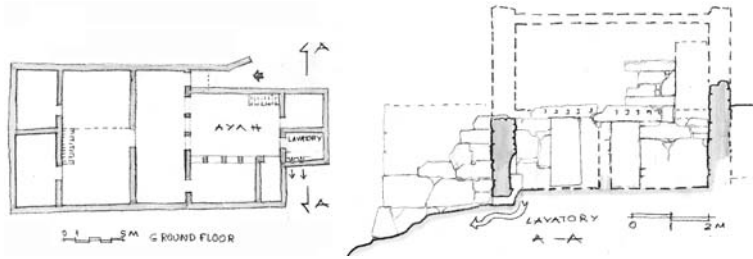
Plan of a typical house in Dystos and the section of the ruined house (copyright permission with G. Antoniou)
